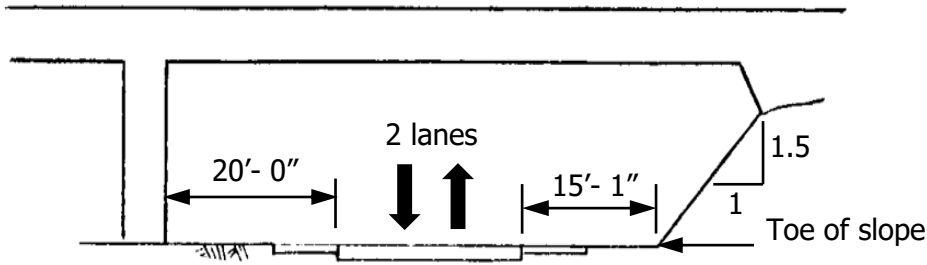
Bridge elevation view of horizontal clearances for a 2-lane highway with 2-way traffic below the bridge.
